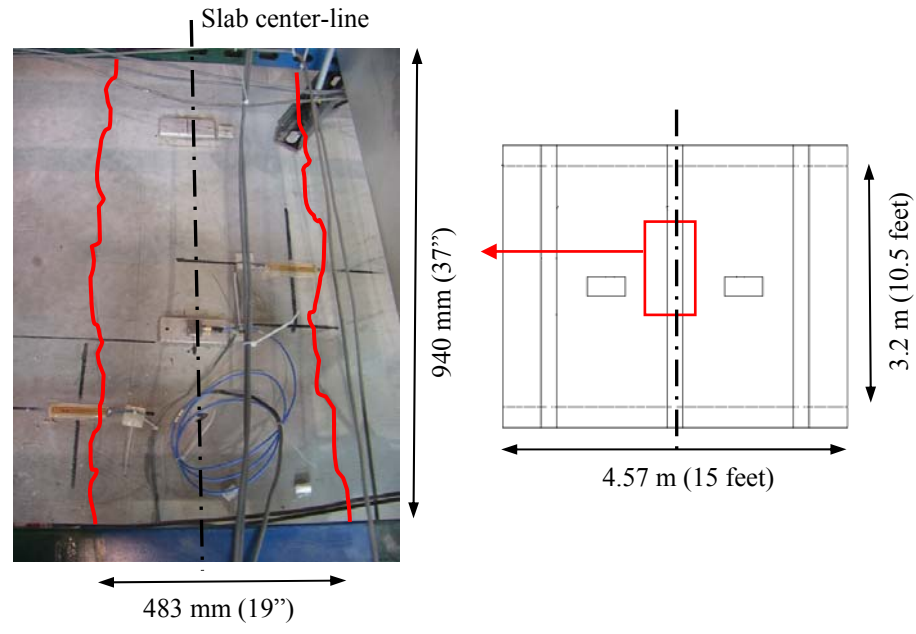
Visual inspection of cracks at 846 kN (190 kips) in slab over center girder
